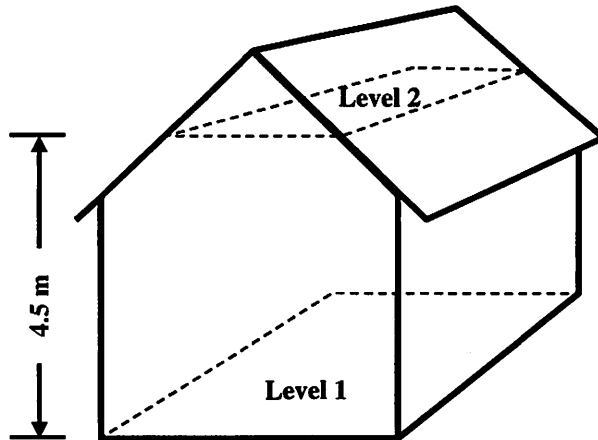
A building containing a vaulted ceiling with multiple wall plates.
